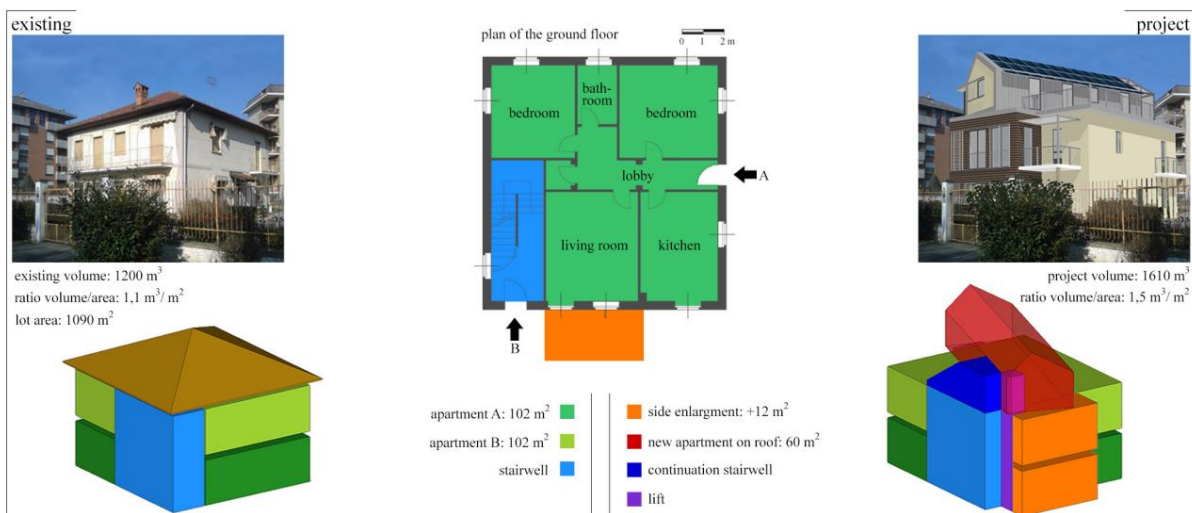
The residential building used as case-study: existing and project schemes (the second floor having the same layout of ground floor).
